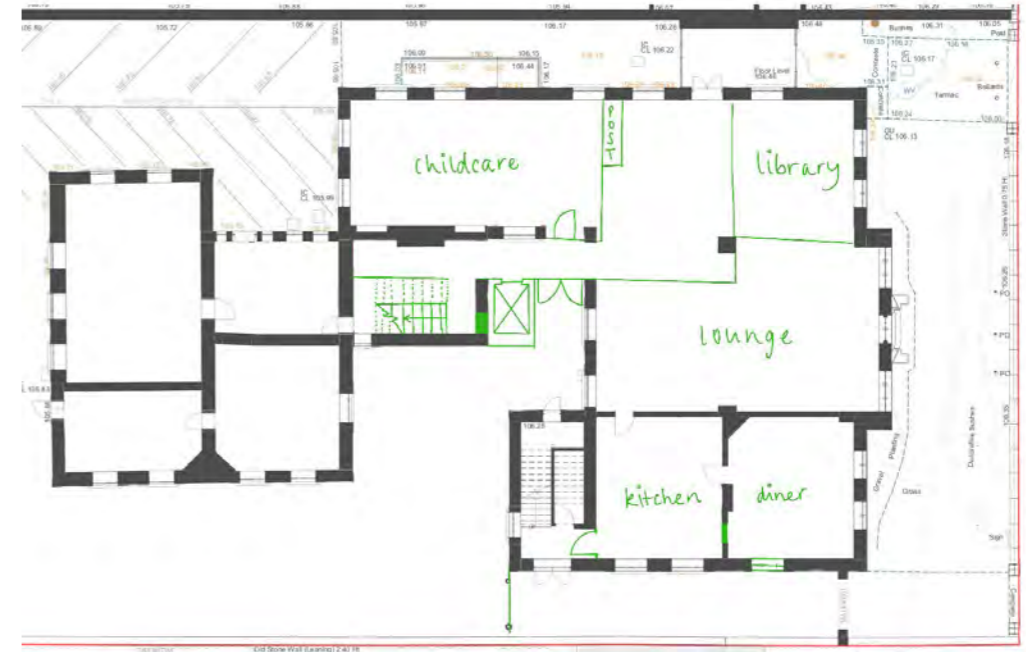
Author's Own. 2024. Ground Floor Space Plan Sketch.
